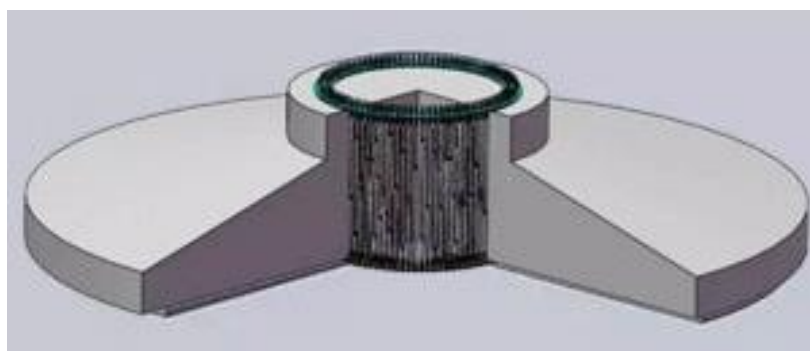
Gravity foundation with anchorage cage (CNBM, 2017)
